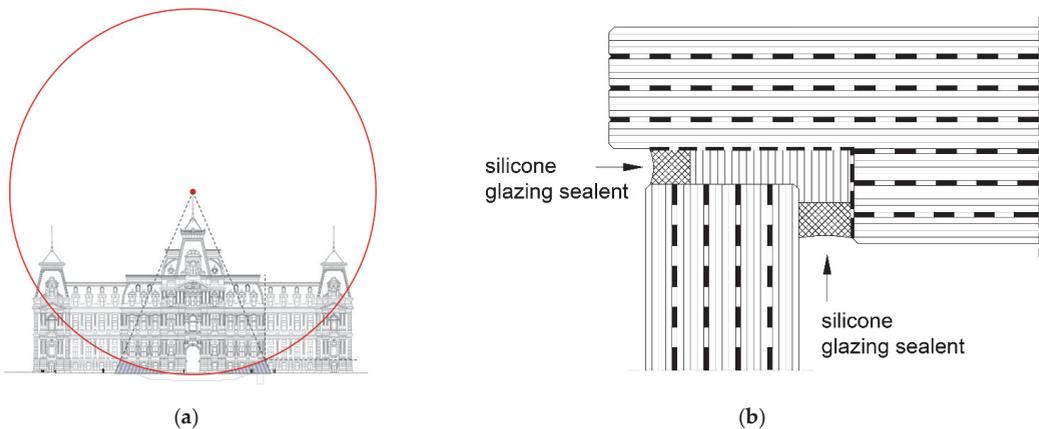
The underground station Dilworth Park in Philadelphia: (a) form of pavilions (© Kieran-Timberlake), (b) detail of roof plate–wall connection (developed by the author based on [112]).
